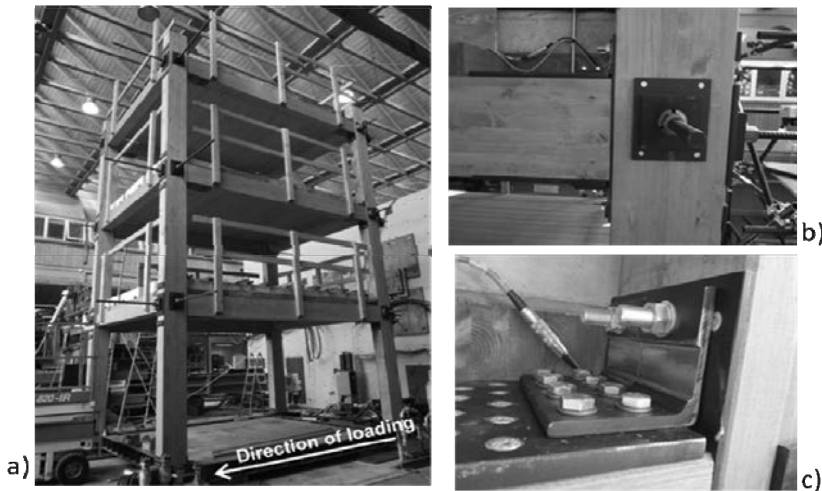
a) 2/3 Scale Post-Tensioned Glulam Test Frame; b) Post-Tensioned Glulam Frame Beam-Column Connection; c) Yielding Steel Angle dissipation devices.
